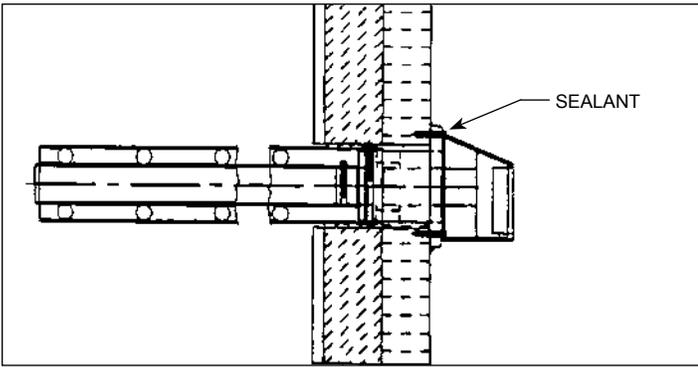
D - Securing Vent Termination Assembly To The Exterior Wall.
